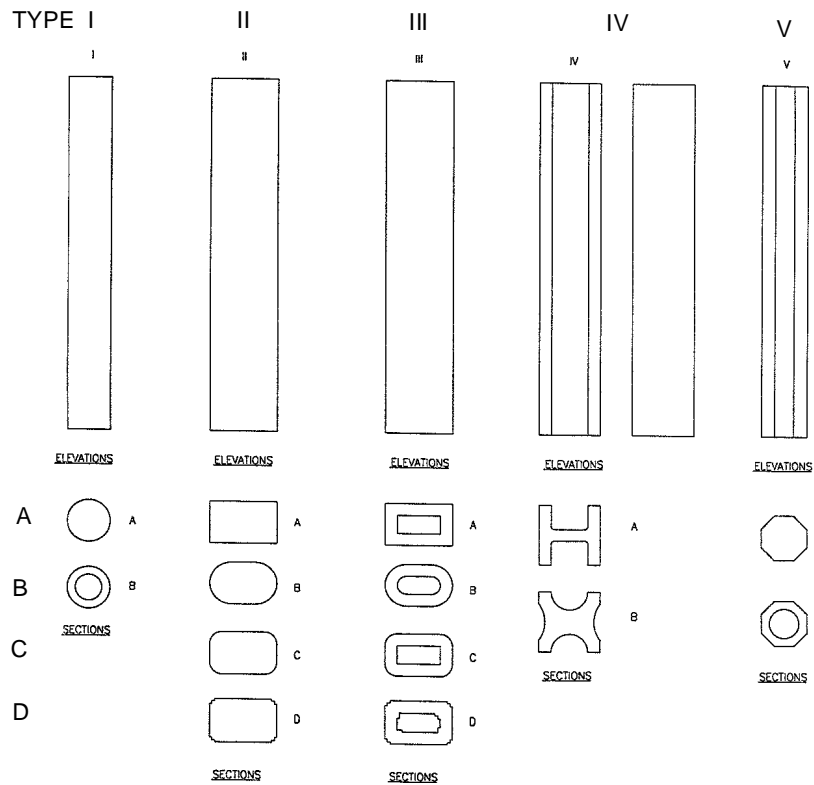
Elevation and Section Views of FDOT Standard Shapes for Precast Columns
